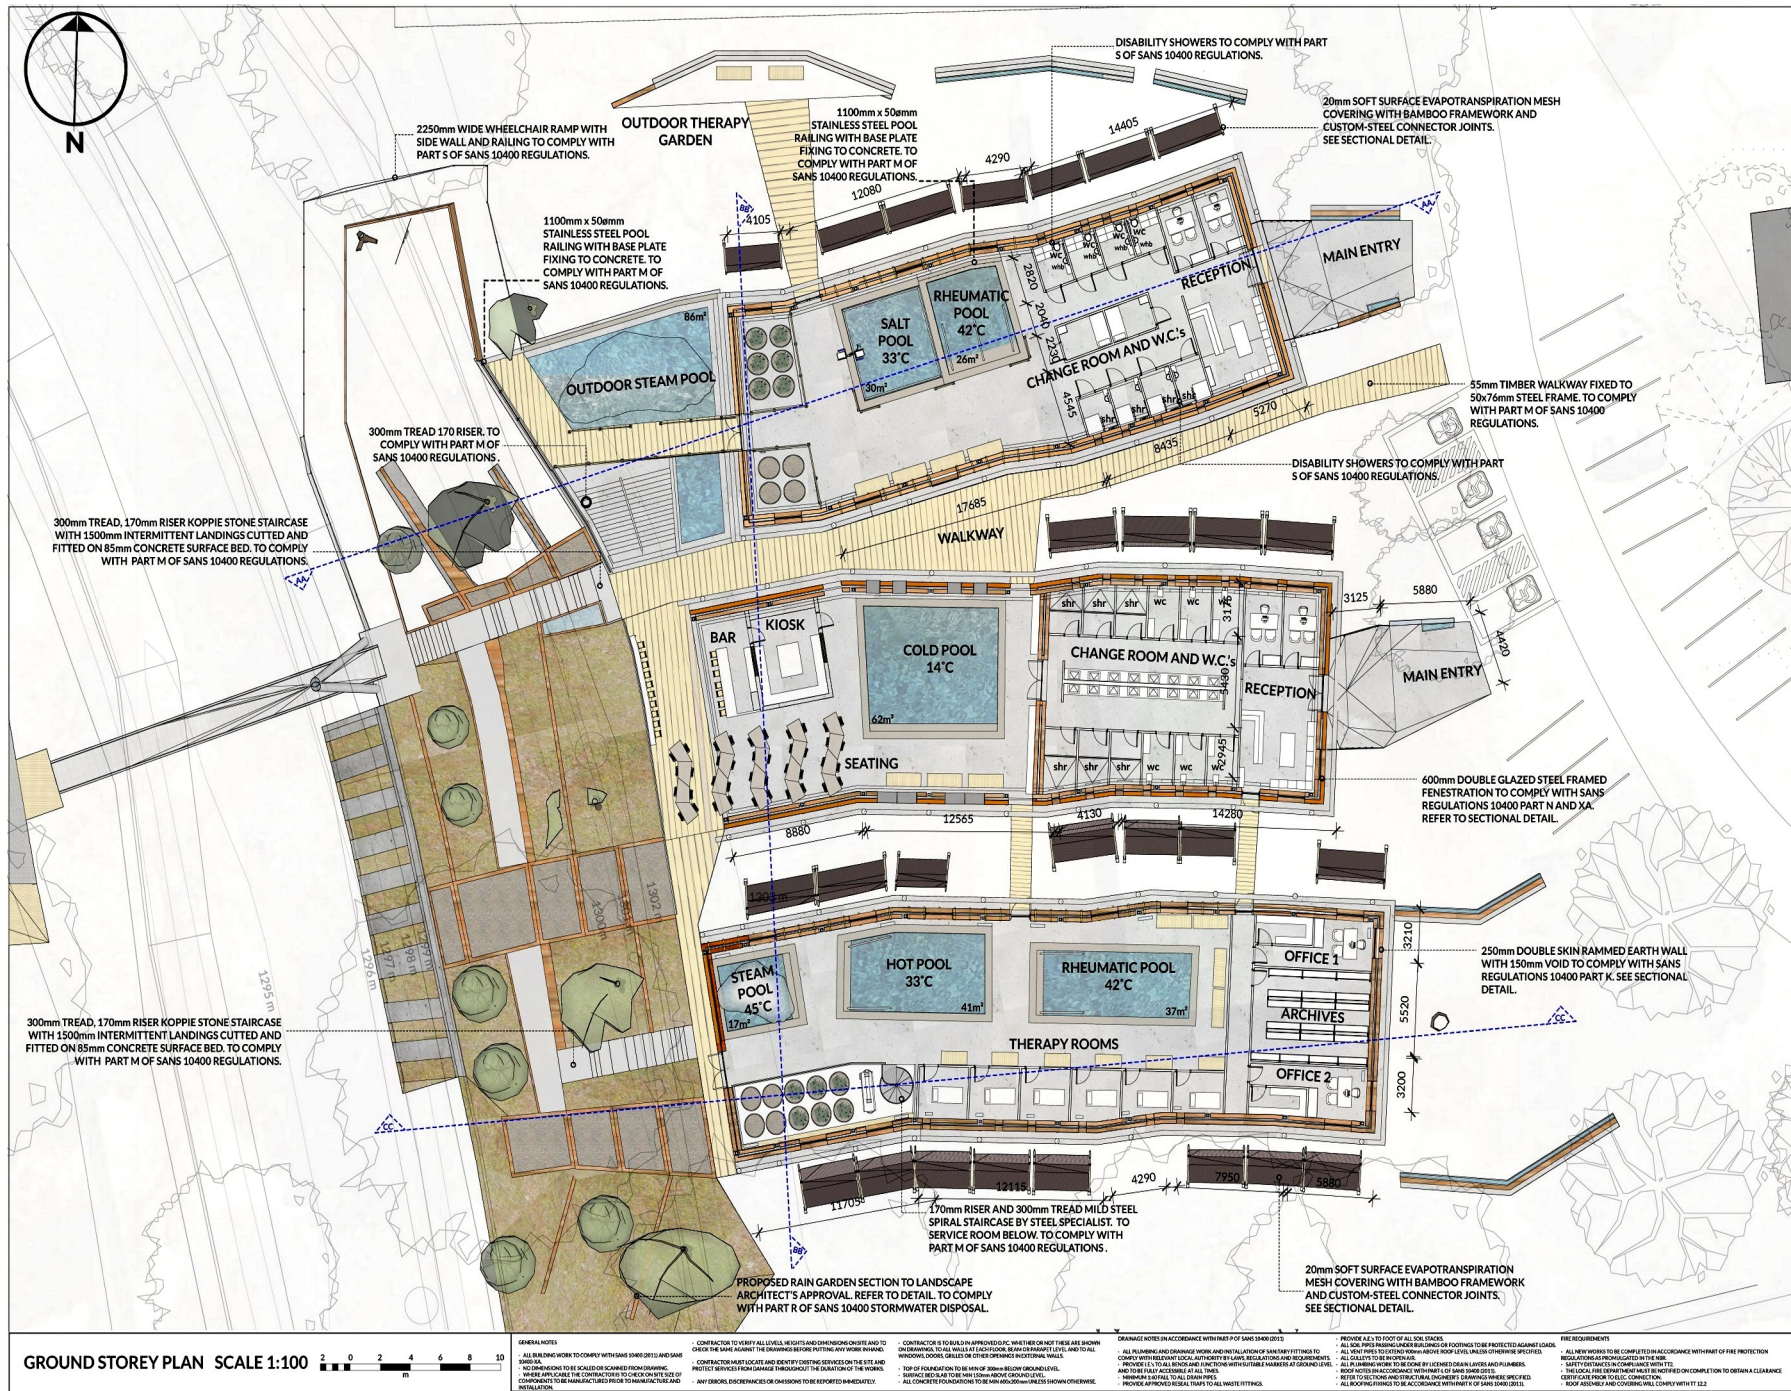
Technical iteration 04 - Ground Storey Plan. Author, 2016.
